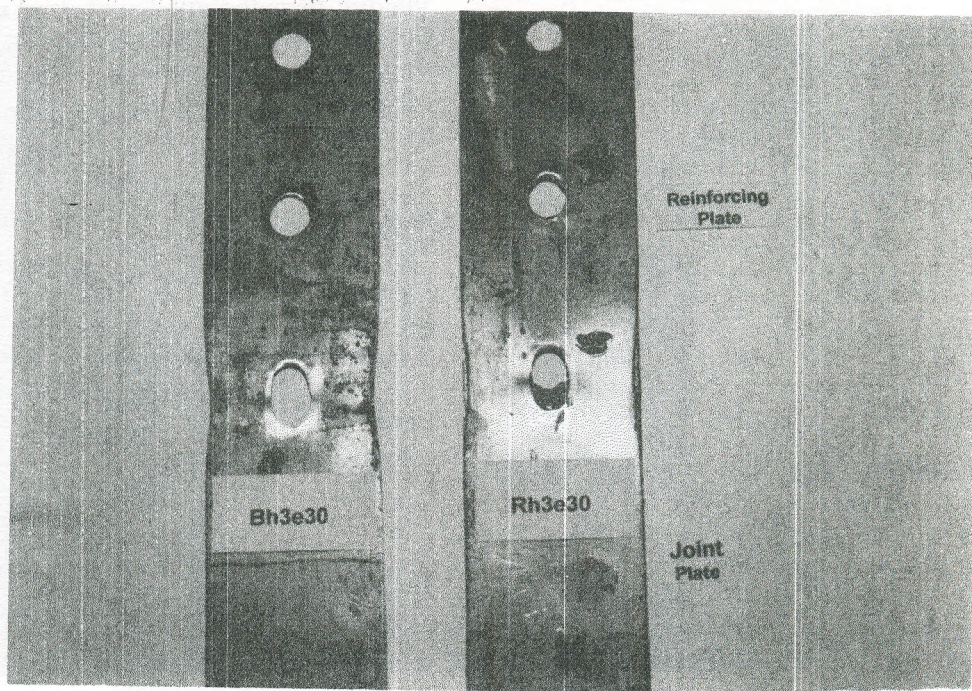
Failure of bolted and reinforced joints with 3 bolts.
